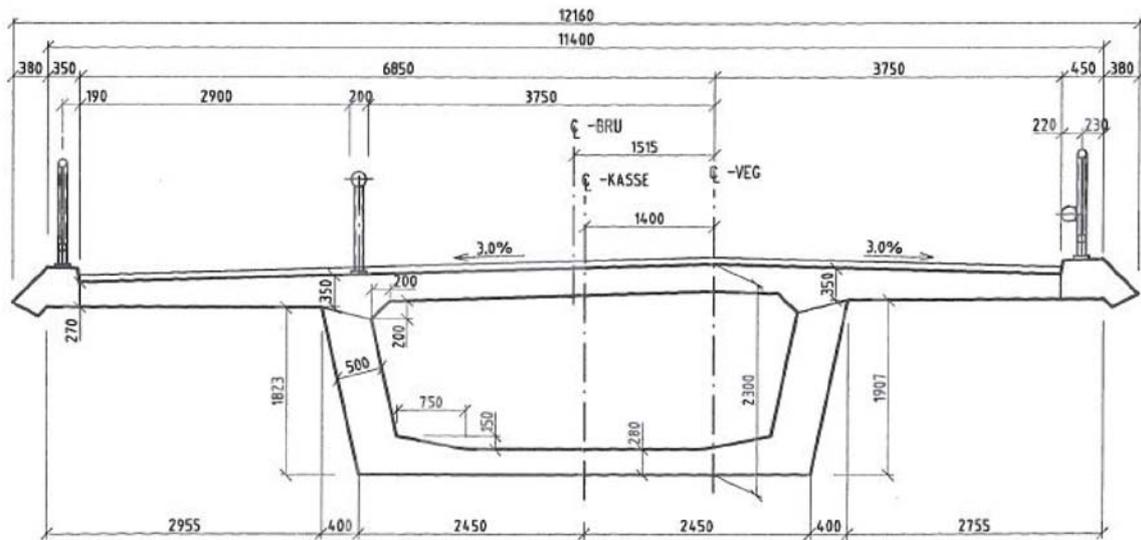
Hillersvika Concrete Box Girder Bridge has an effective bridge width of 10,6 m.
